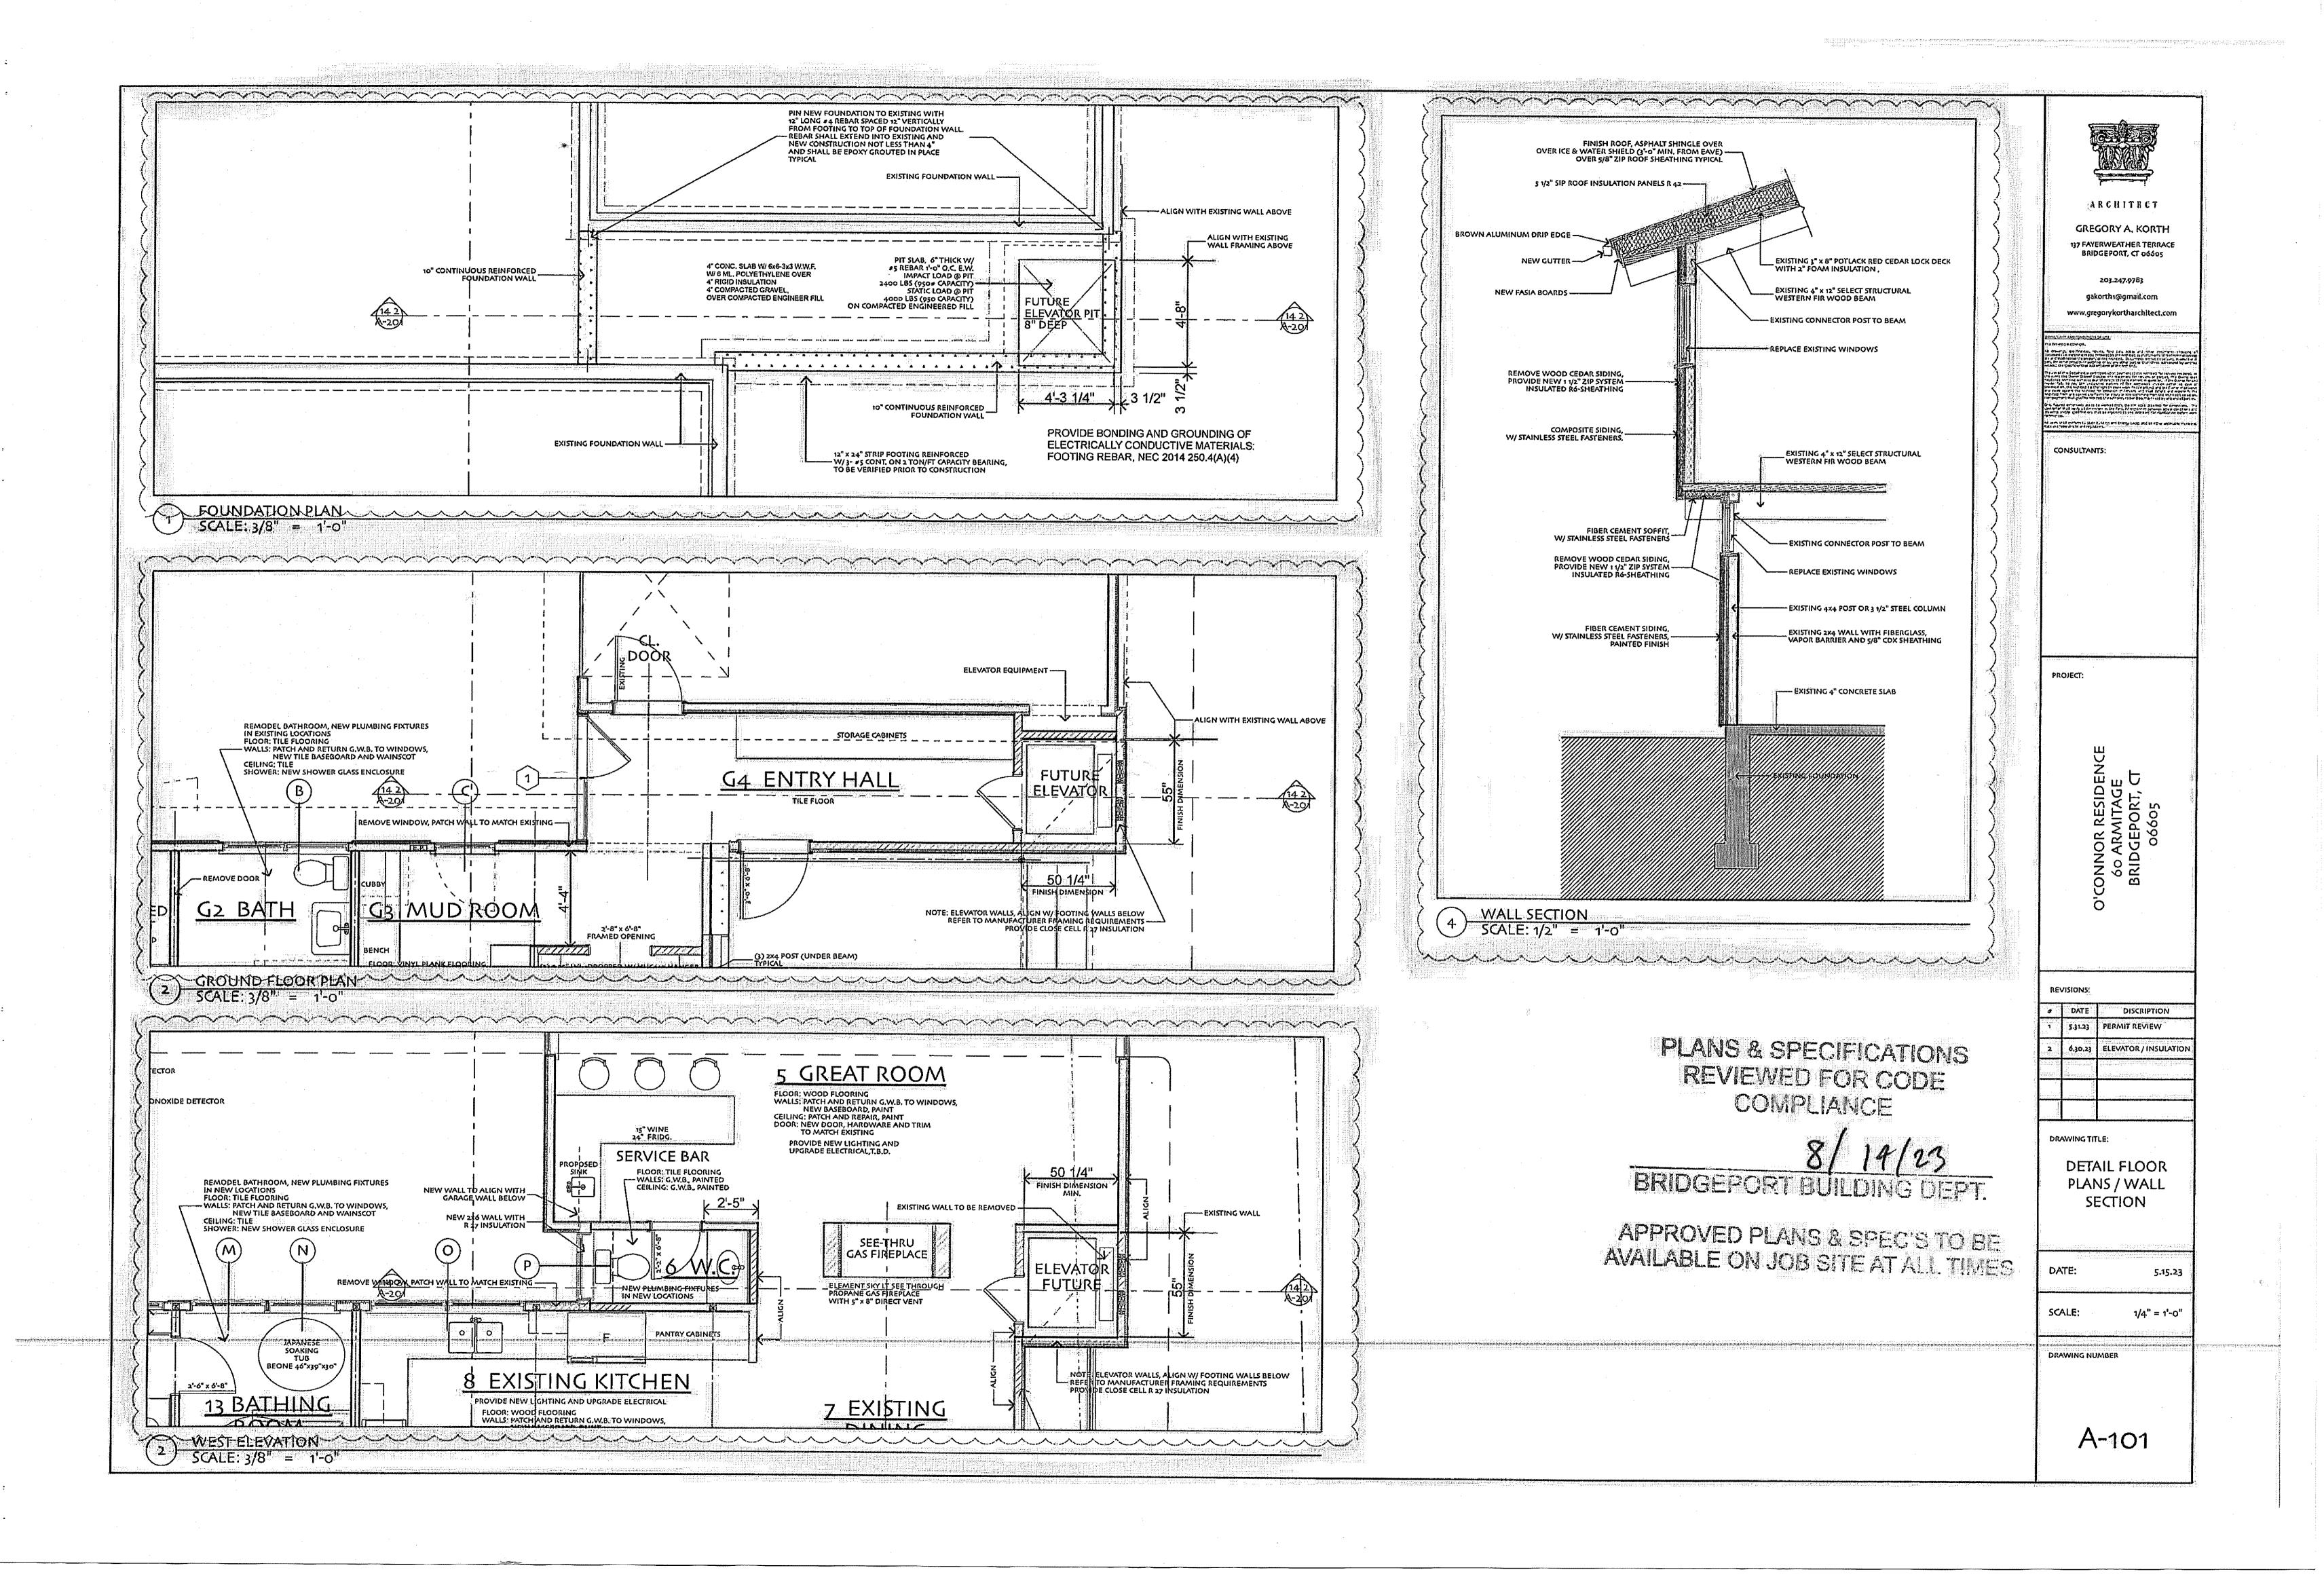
DETAIL FLOOR PLANS / WALL SECTION WEST / SOUTH / ÉAST ELEVATION
